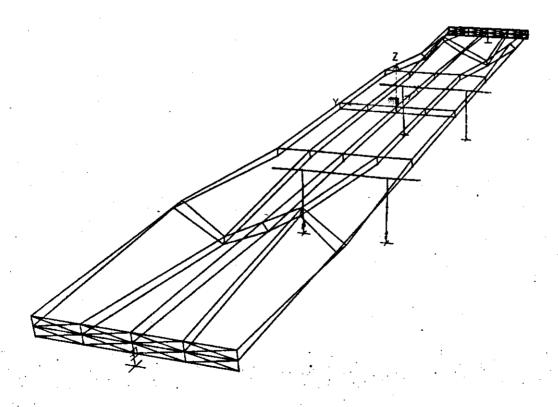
Mode 4, Period 0.0854 Seconds (New Wahite Ditch Bridge)
